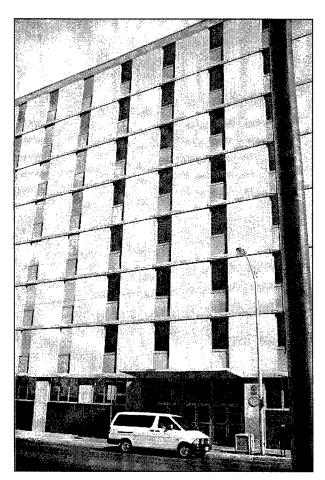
Exterior of the Federal Building in Albuquerque, which is considered structurally unsound.
